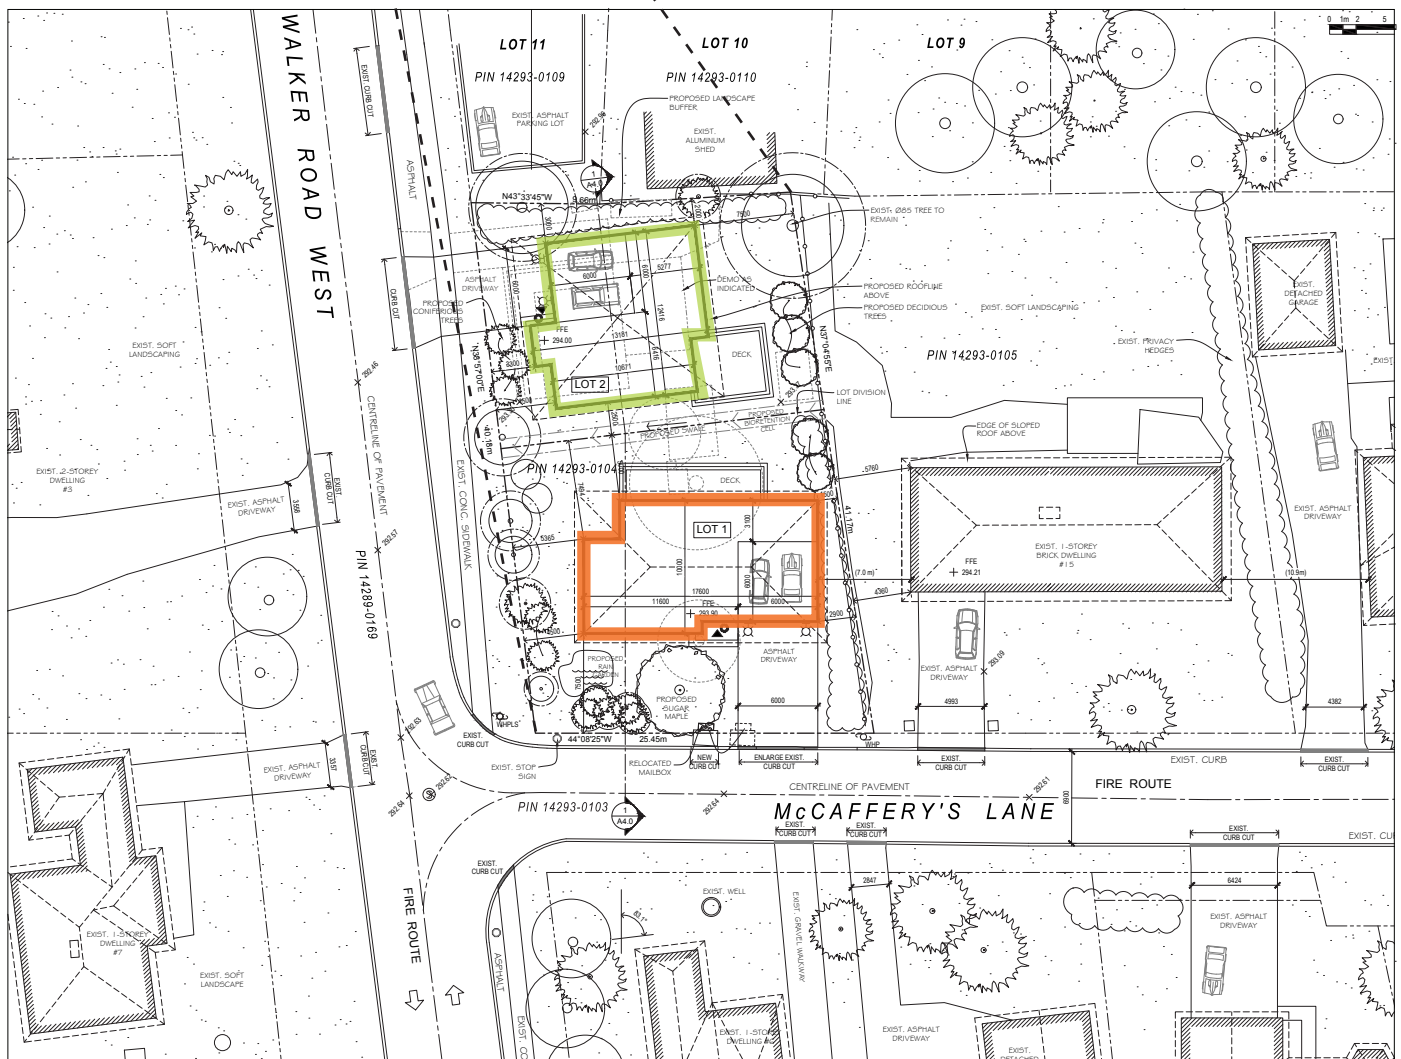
Proposed Site Plan Showing Lots 1 and 2; V&A Architects, 2019.07.15
